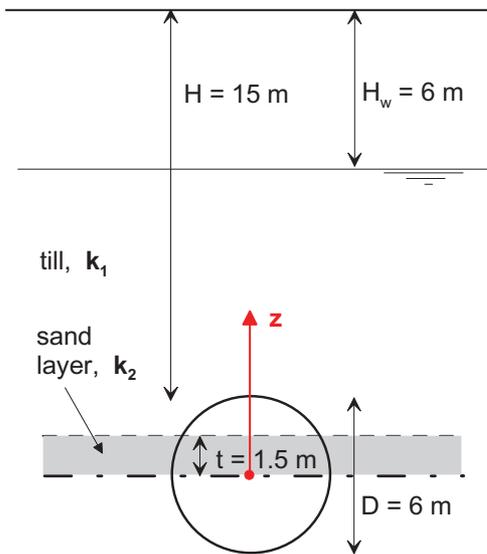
Typical cross-section of tunnel with the sand layer positioned in the first upper half the face.
